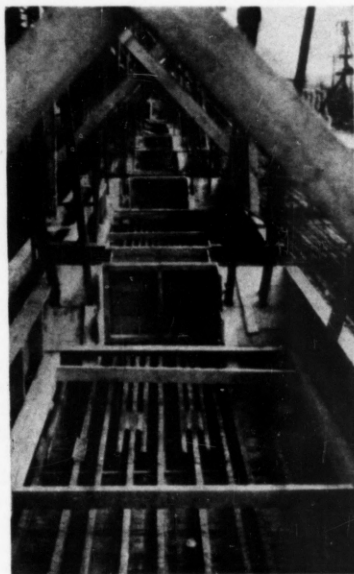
TRUSS FORMS and reinforcing. Chord steel, before concreting, is spliced by welded plates.
